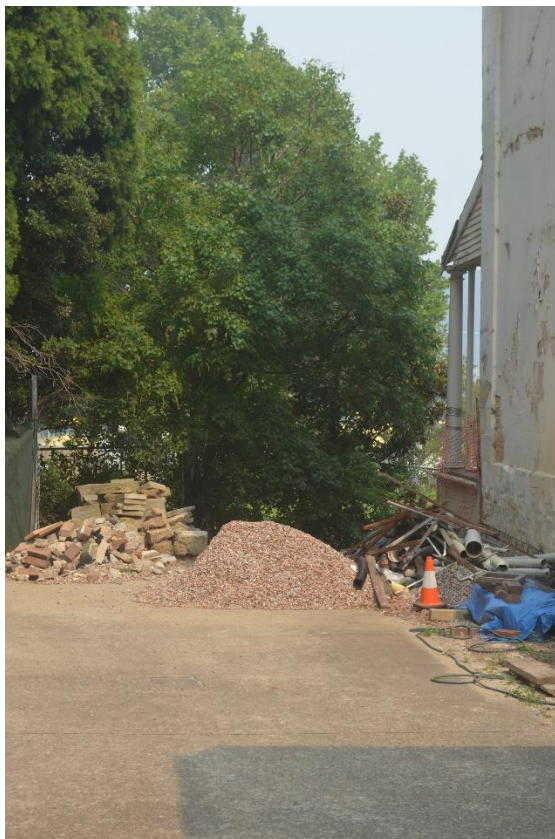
Site viewed from Buckingham Street, looking west towards Bedford Street
